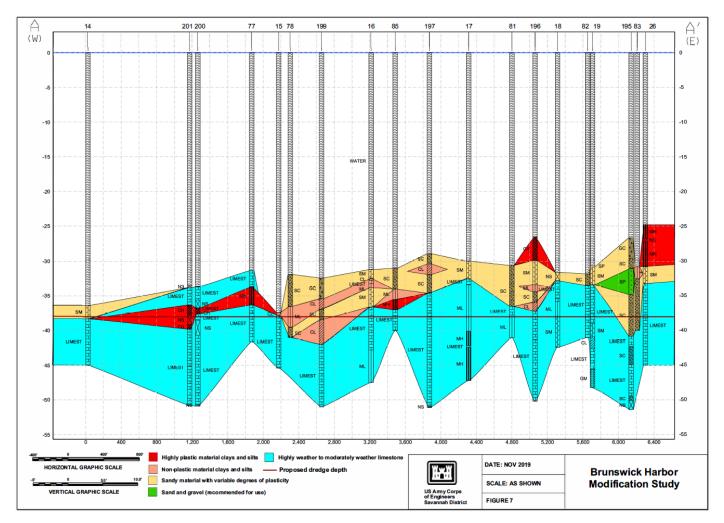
Sediment Profile Based on Historical Borings near Sidney Lanier Bridge Meeting Area, A-A'
